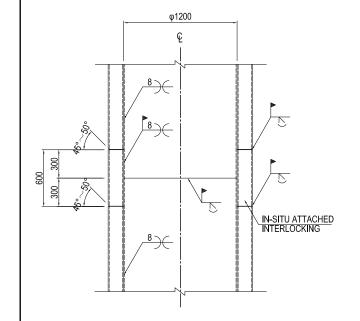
# DETAIL OF INTERLOCKING OF STEEL PIPE SHEET PILE OF P19 PIER
